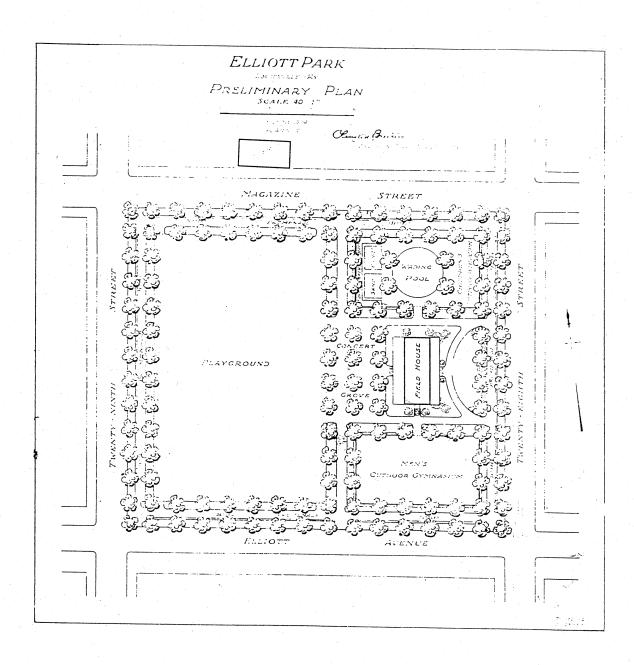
Preliminary Plan Elliott Park, Louisville, KY, Olmsted Brothers. Courtesy Beveridge collection.
